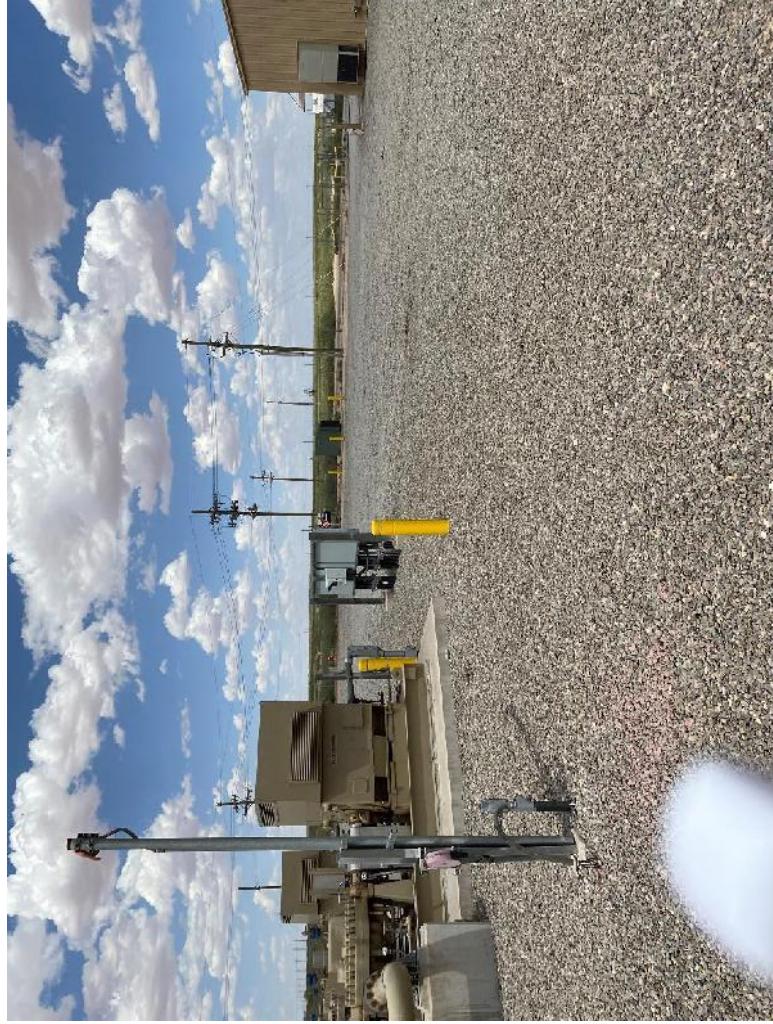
Photograph location 5. August 22, 2024. Northwest corner of building facing west. View of aboveground pipelines and stockpile gravel.
